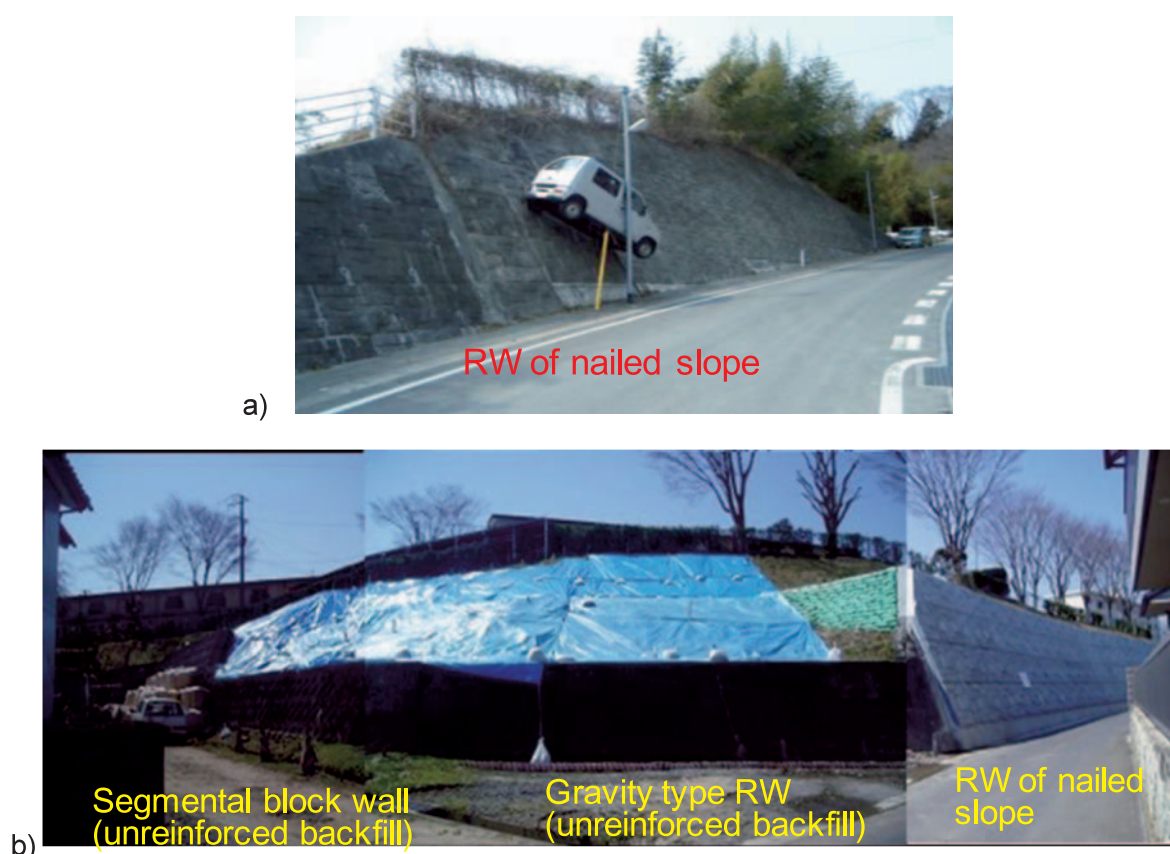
a) Nailed wall of cut slope that survived the earthquake; and b) damaged conventional retaining walls (segmental block wall and gravity type wall) and an adjacent undamaged nailed wall of cut slope (Kodaka, T.)
